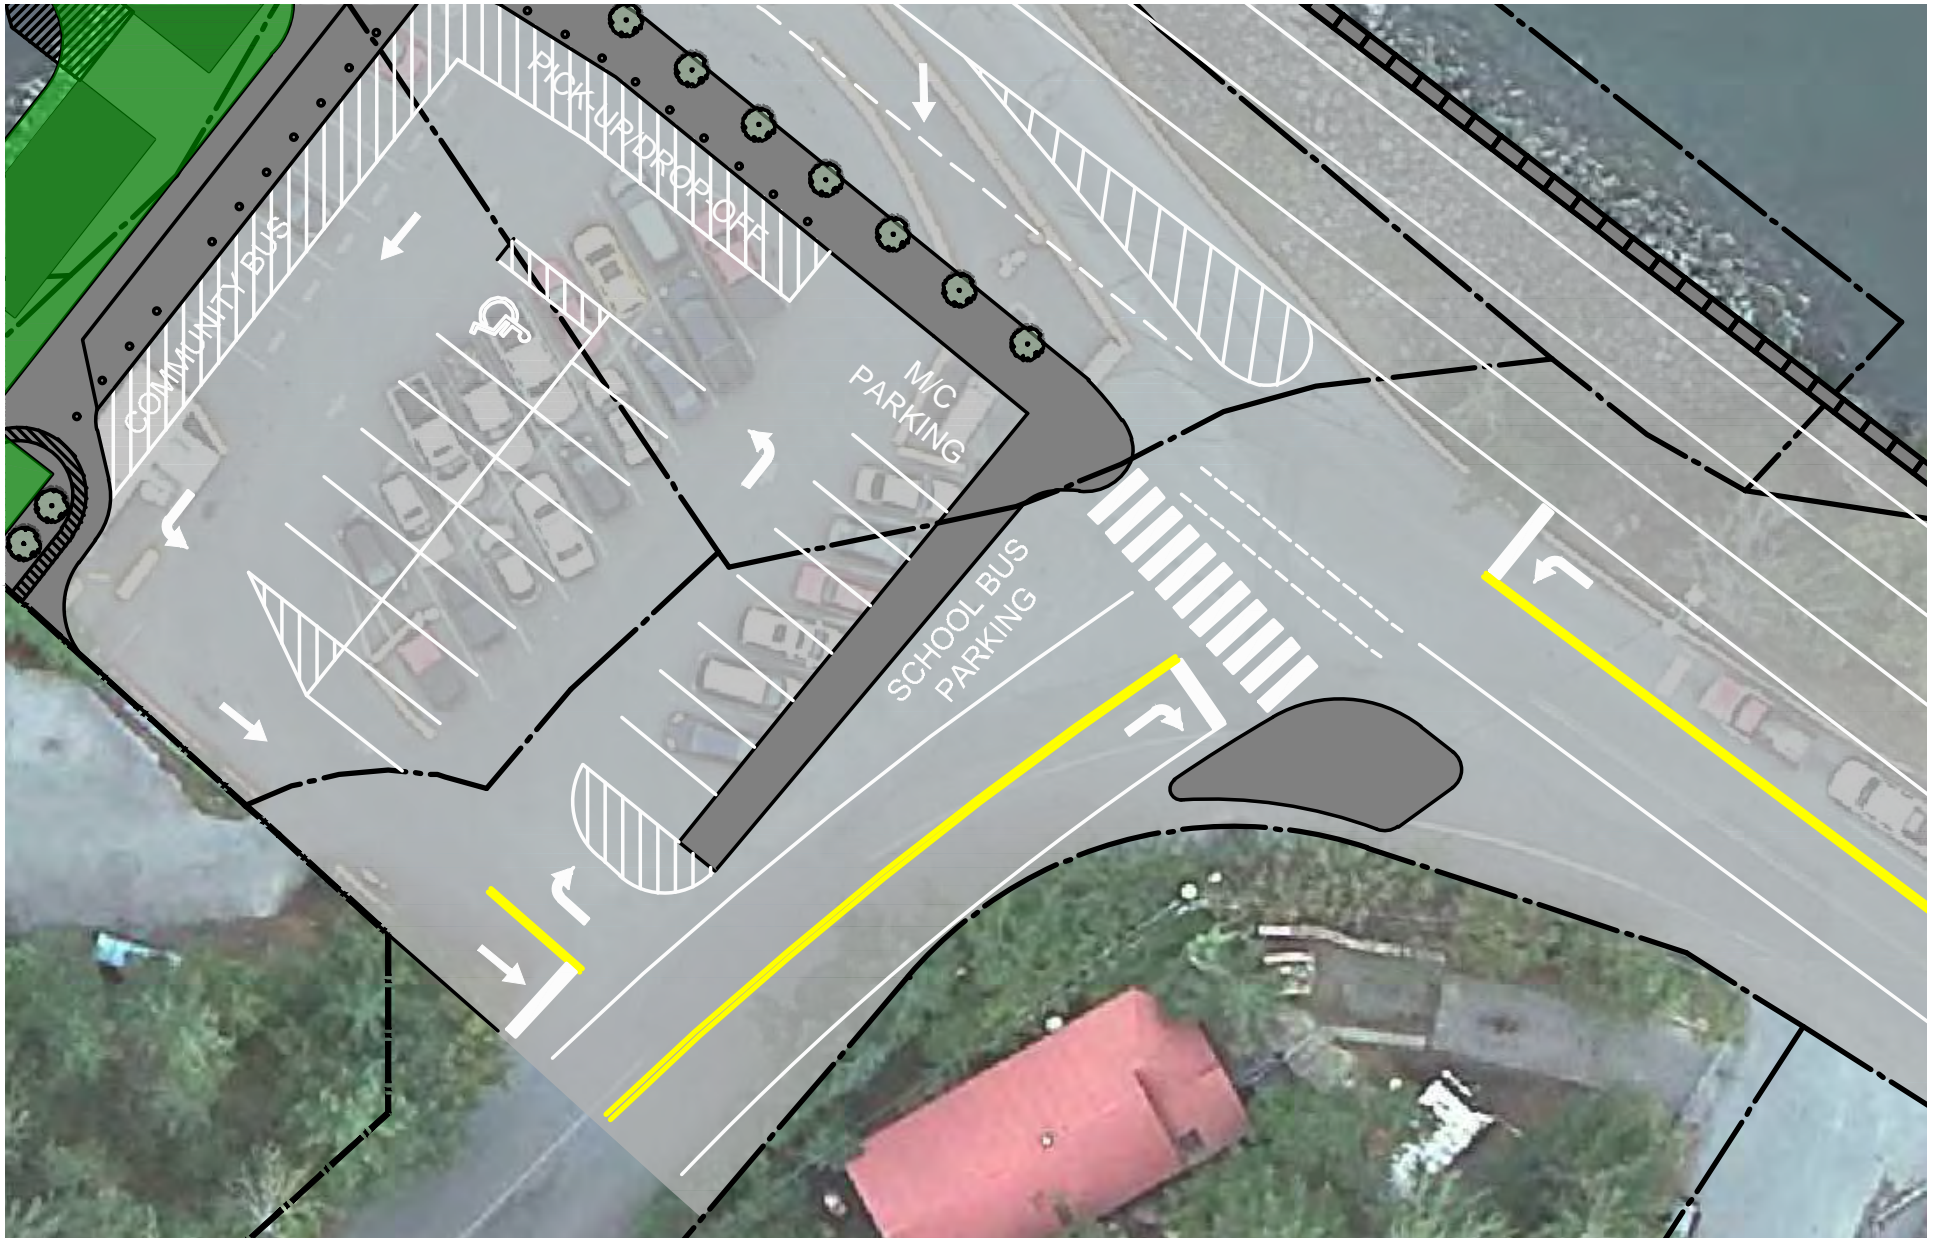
Illustrative Concept Plans for Pick-Up/Drop-Off Area
